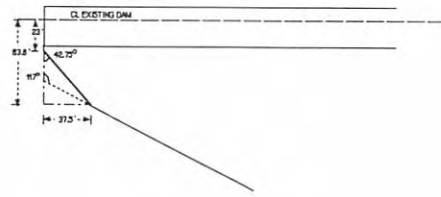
The 117° angled wall, with fillet, ending 60 ft downstream from the dam at El. 6390.0, showing the PMF flow rate contained by a 20-ft-high wall.
